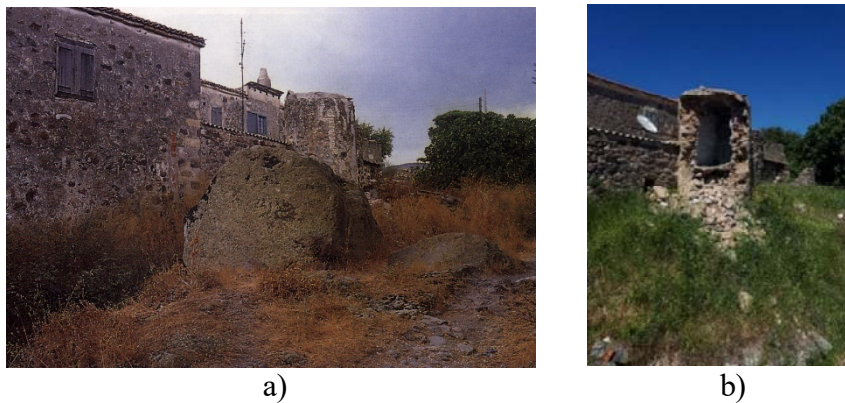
Toilets. a) Circular plan separate toilet before its collapse. (Source: Erzen, J.n.d.) b) Collapsed circular toilet. April 26, 2017.
